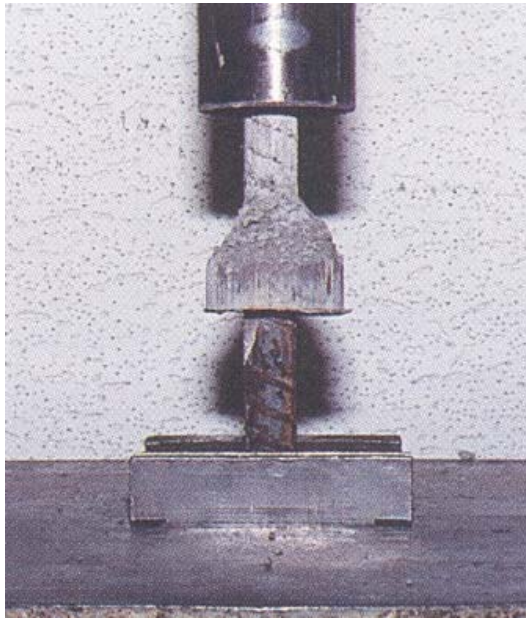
Pullout Failure of Generic Grout-Filled Splice Sleeve [1.18]
